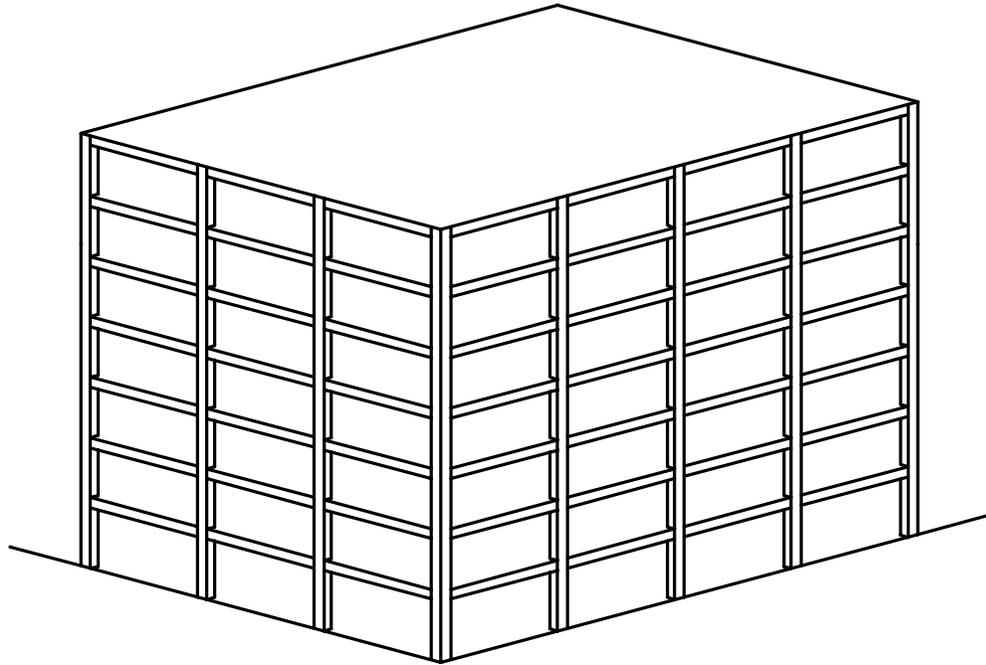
Seven-story concrete special moment resisting frame (SMRF) building
